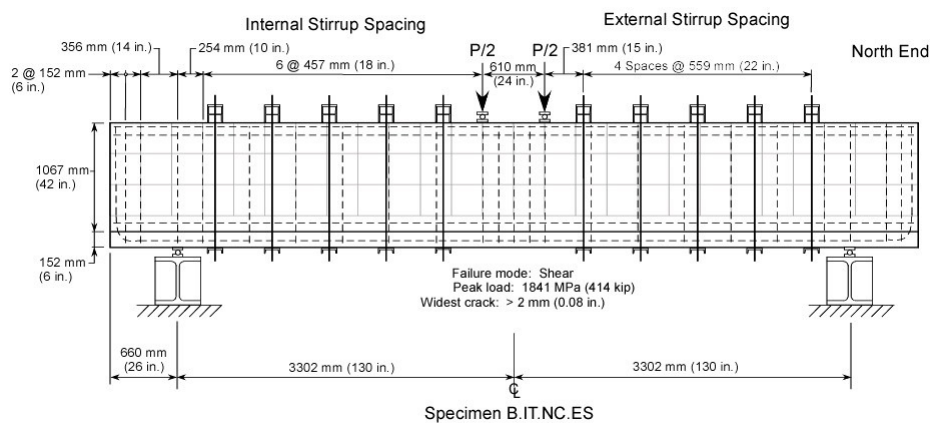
Specimen B.IT.NC.ES repair.
